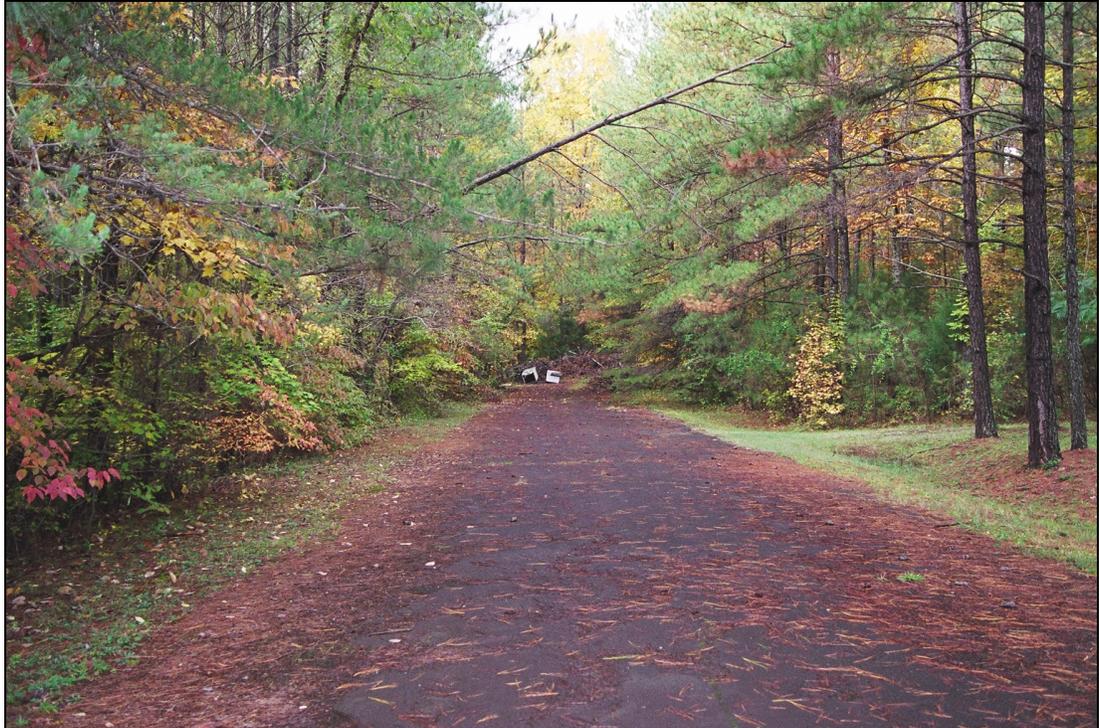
LOCATION OF PROPOSED PUBLIC STREET CONNECTION
